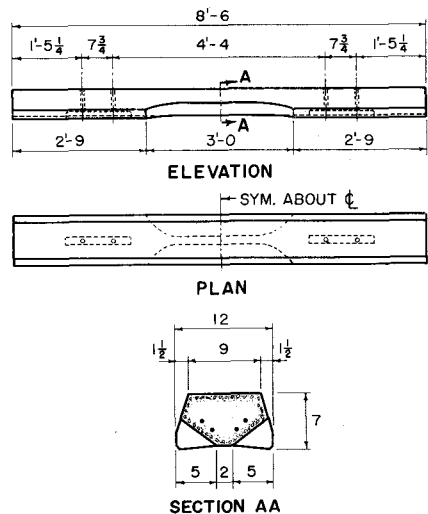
Association of American Railroads Prestressed Concrete Tie Design E.
